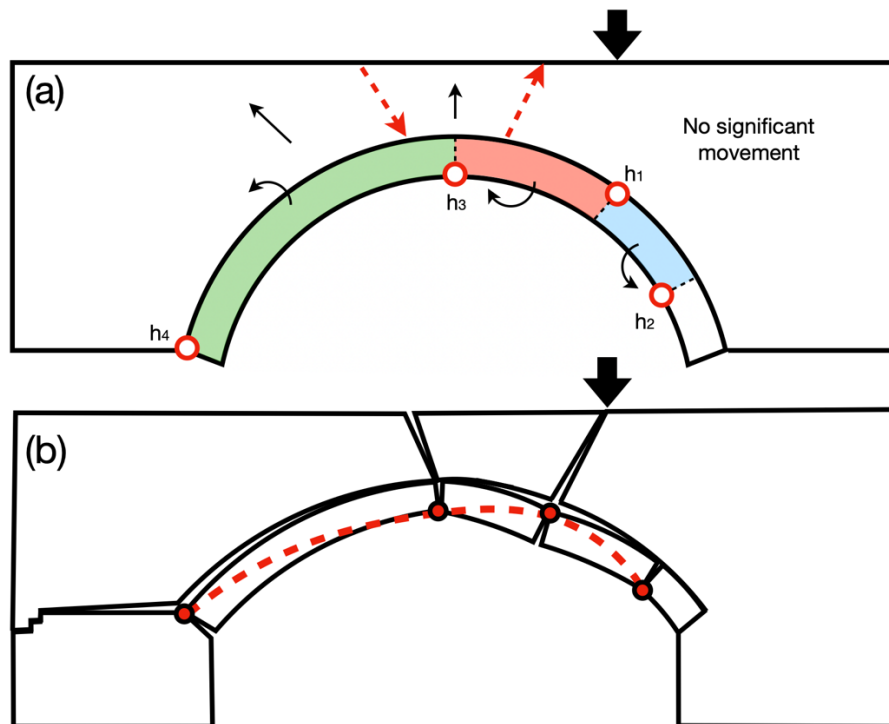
(a) Interaction between spandrel wall and the arch barrel in terms of their deformation compatibility; (b) failure mechanism.
